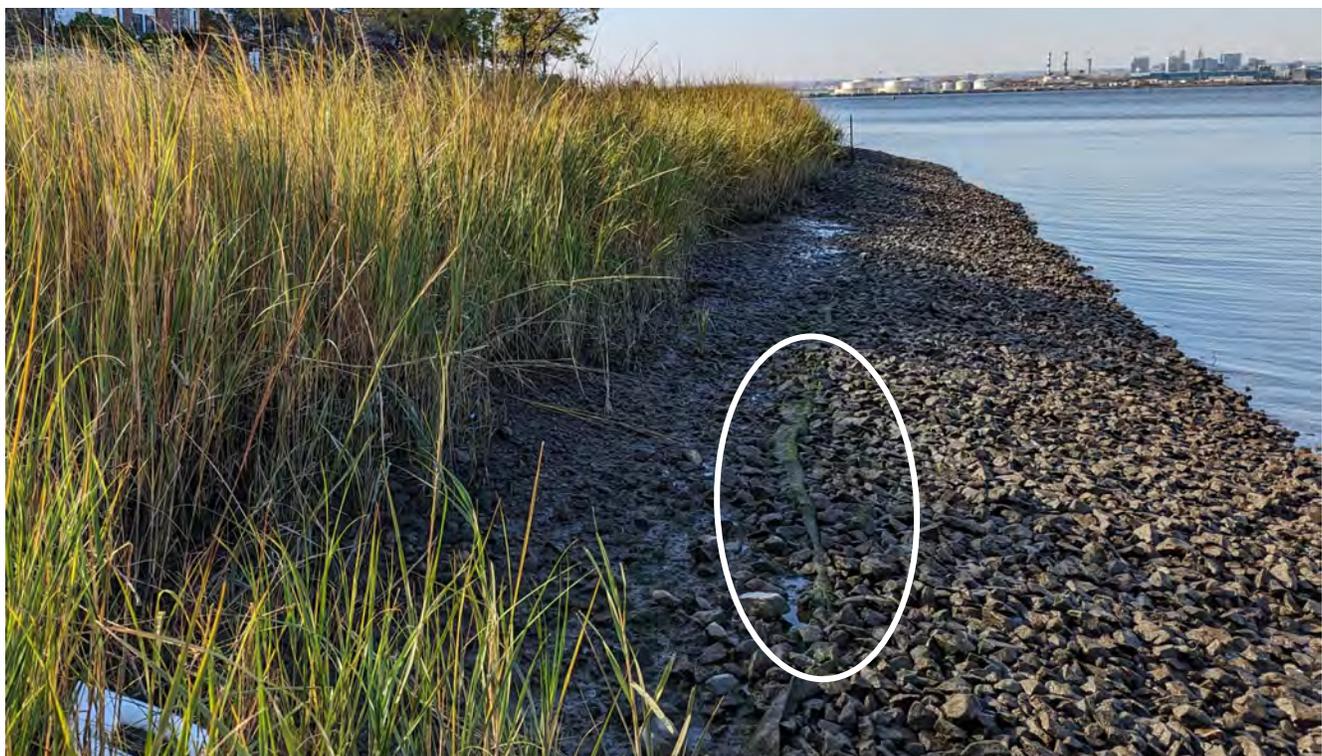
Exposed geotextile fabric between the shoreline stabilization berm and the BEP fill material west of Outfall A (facing west).
